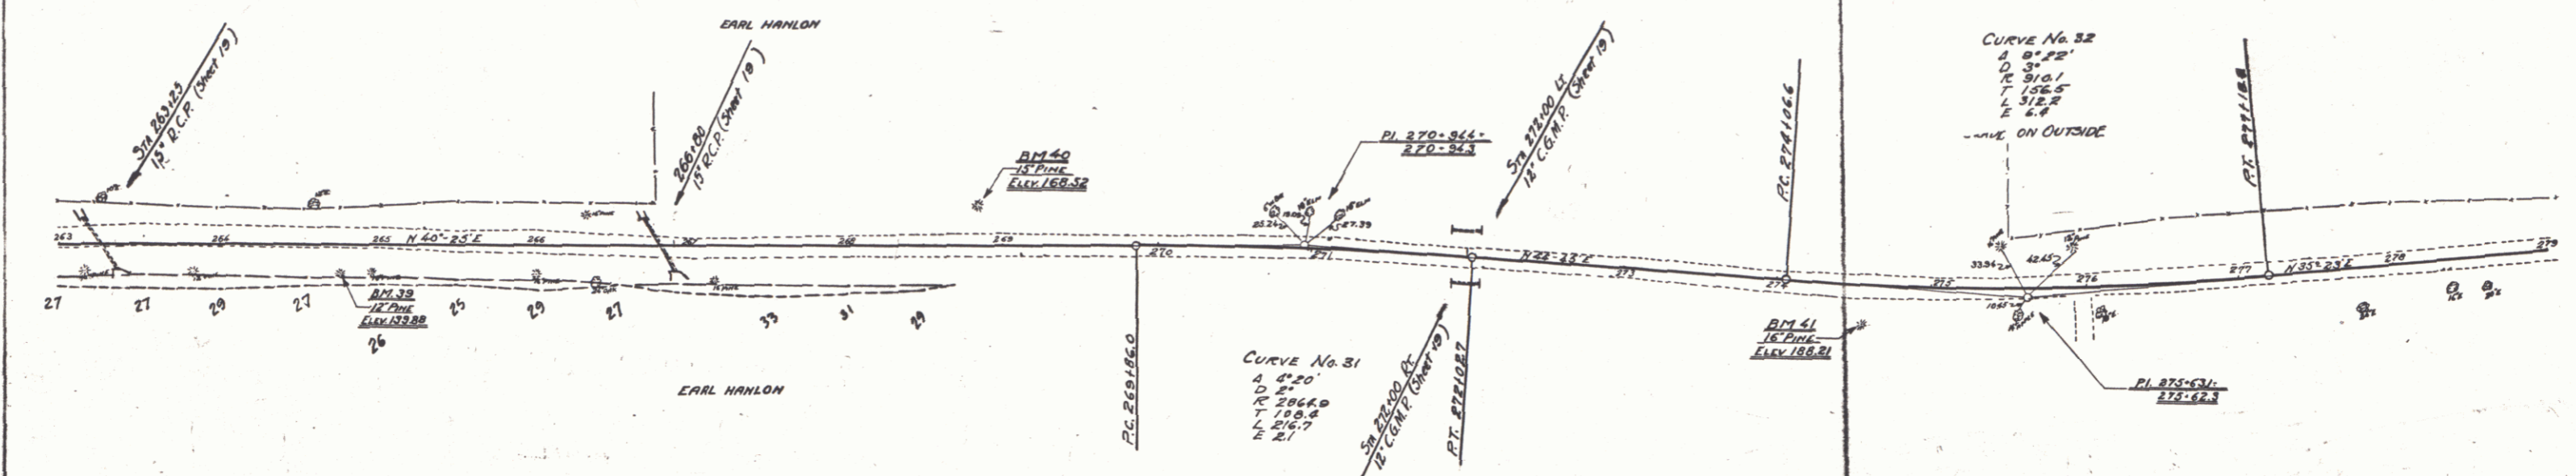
PLAN PROFILE OF R & R BRIDGE
